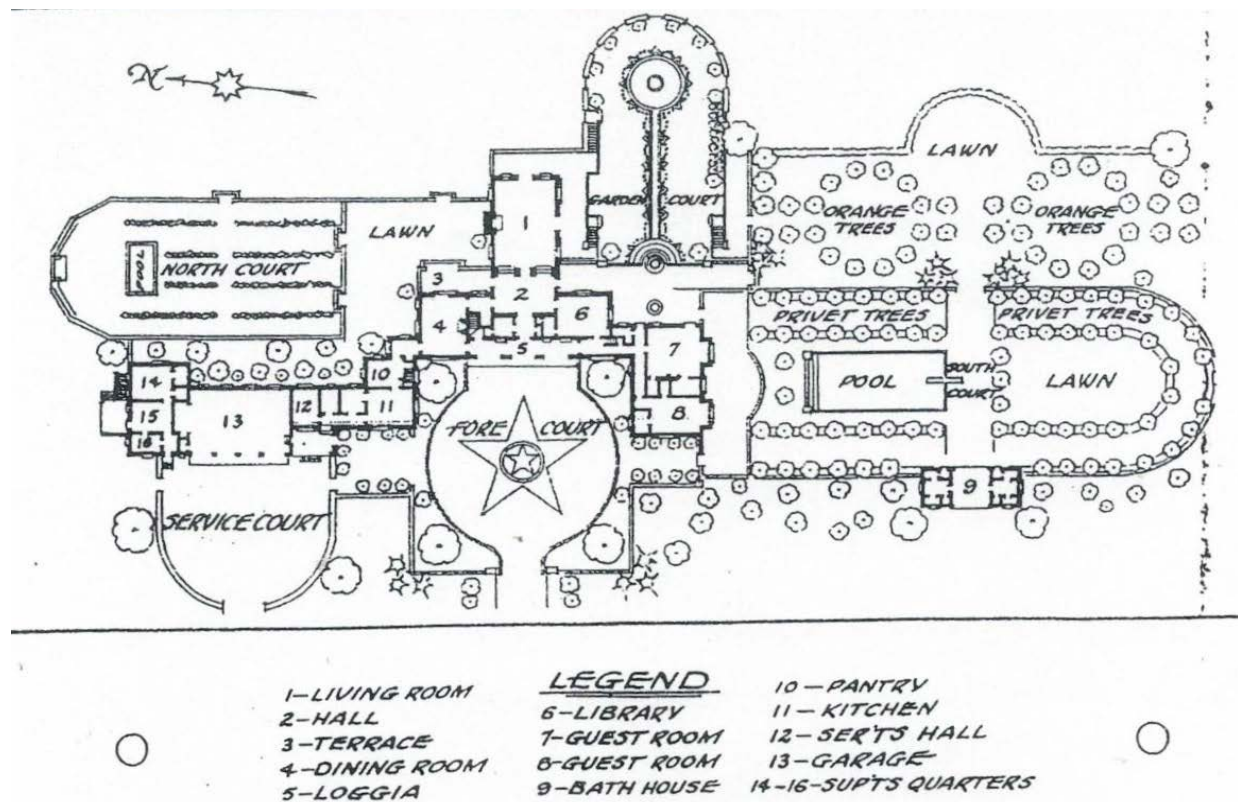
Grosvenor Atterbury's original floor plan/site plan for Stone Ashley, circa 1934.
